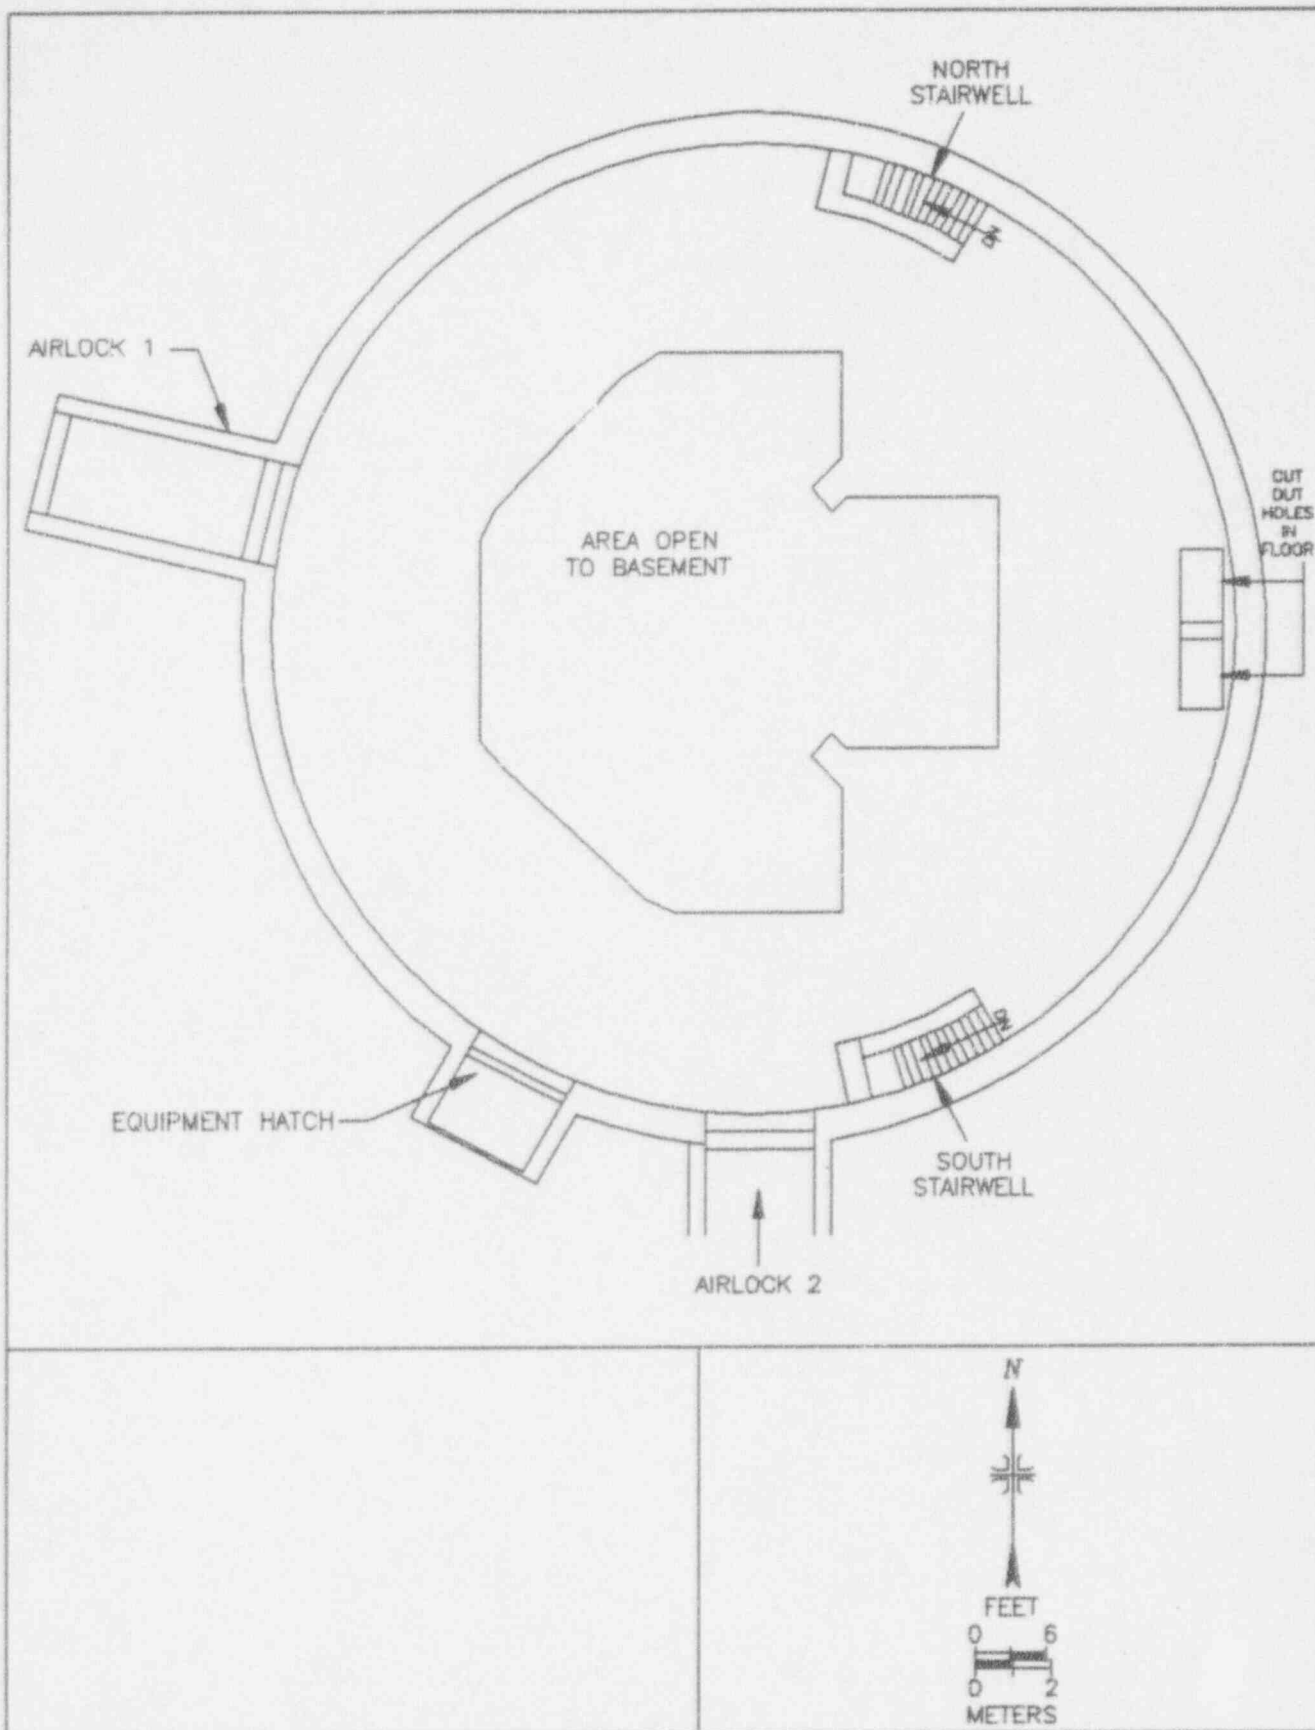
Plot Plan of Building 100, Operating Deck Floor
